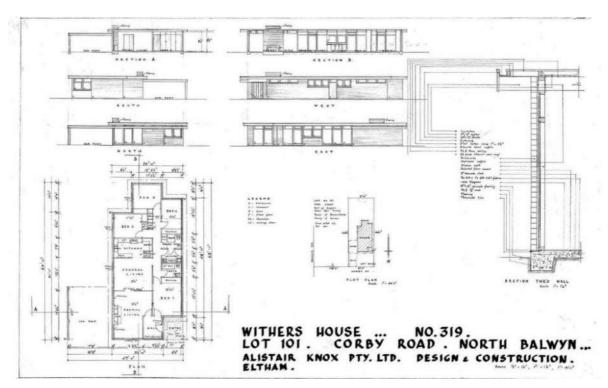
Original drawing for the subject site, this is not the design that was ultimately constructed. Source: https://alistairknox.org/buildings/148
